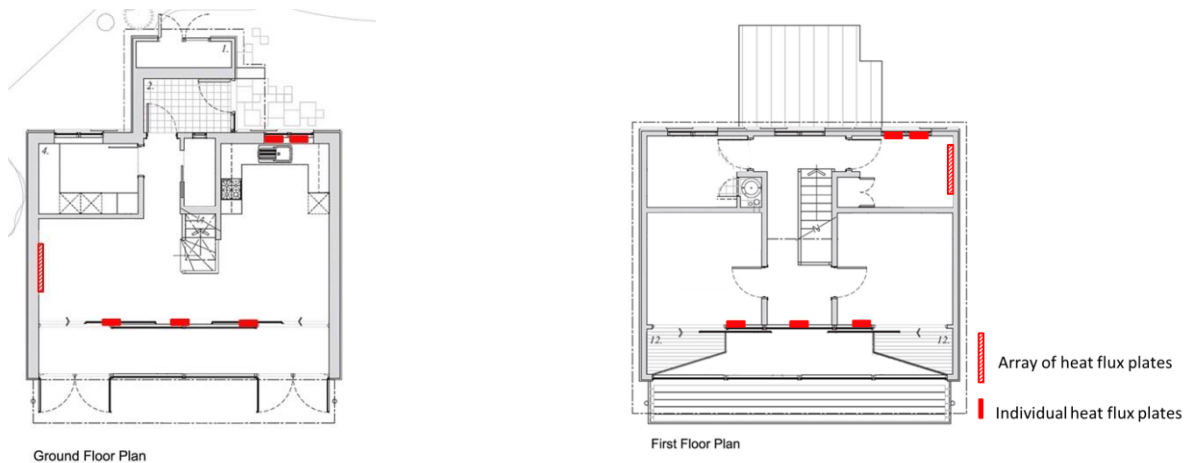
Ground floor (left) and first floor plan (right) of the test house and location of heat flux sensors
